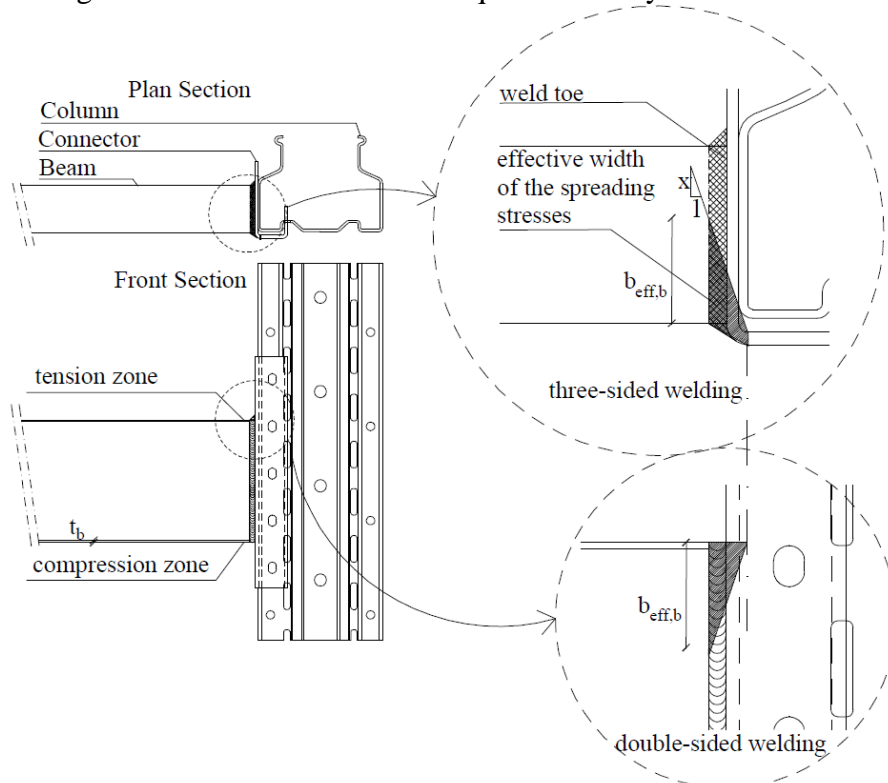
The spreading of stress distribution in the beam flange (connection with a three-sided welding) and in the beam web (connection with a double-sided welding).
